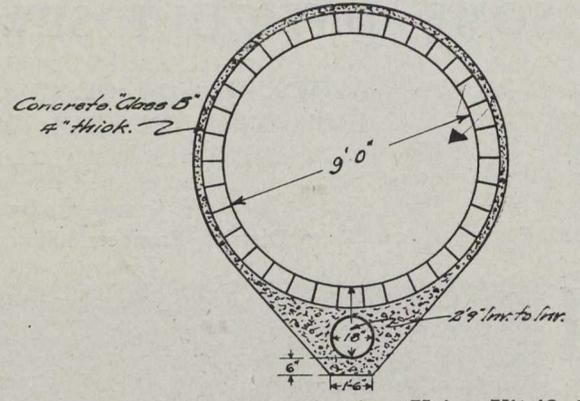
Alternative Section, Using Vitrified Segment Sewer Blocks.
